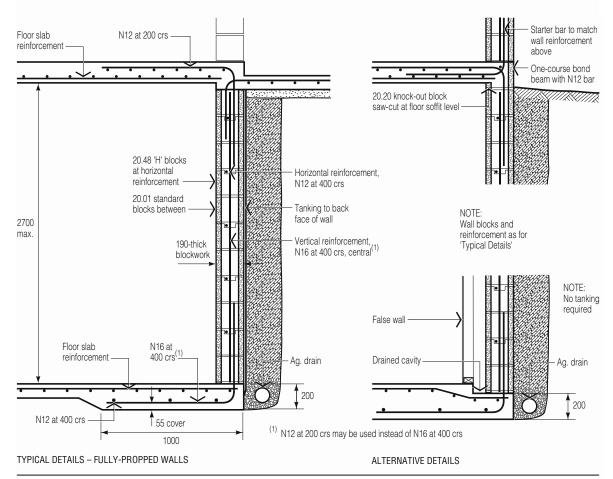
Typical Basement Wall Supporting a Concrete Floor
